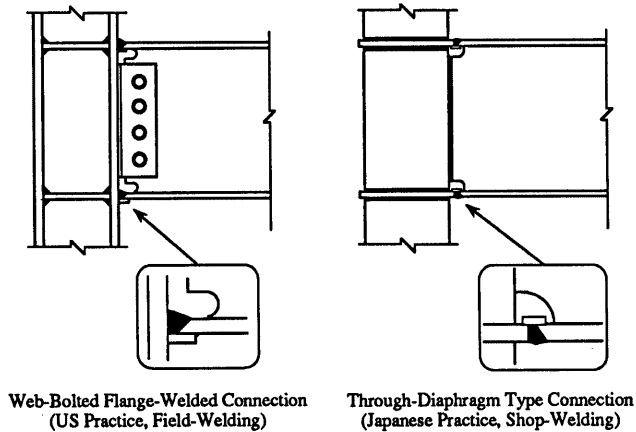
Comparison in details of beam-to-column connections between U.S. and Japan
